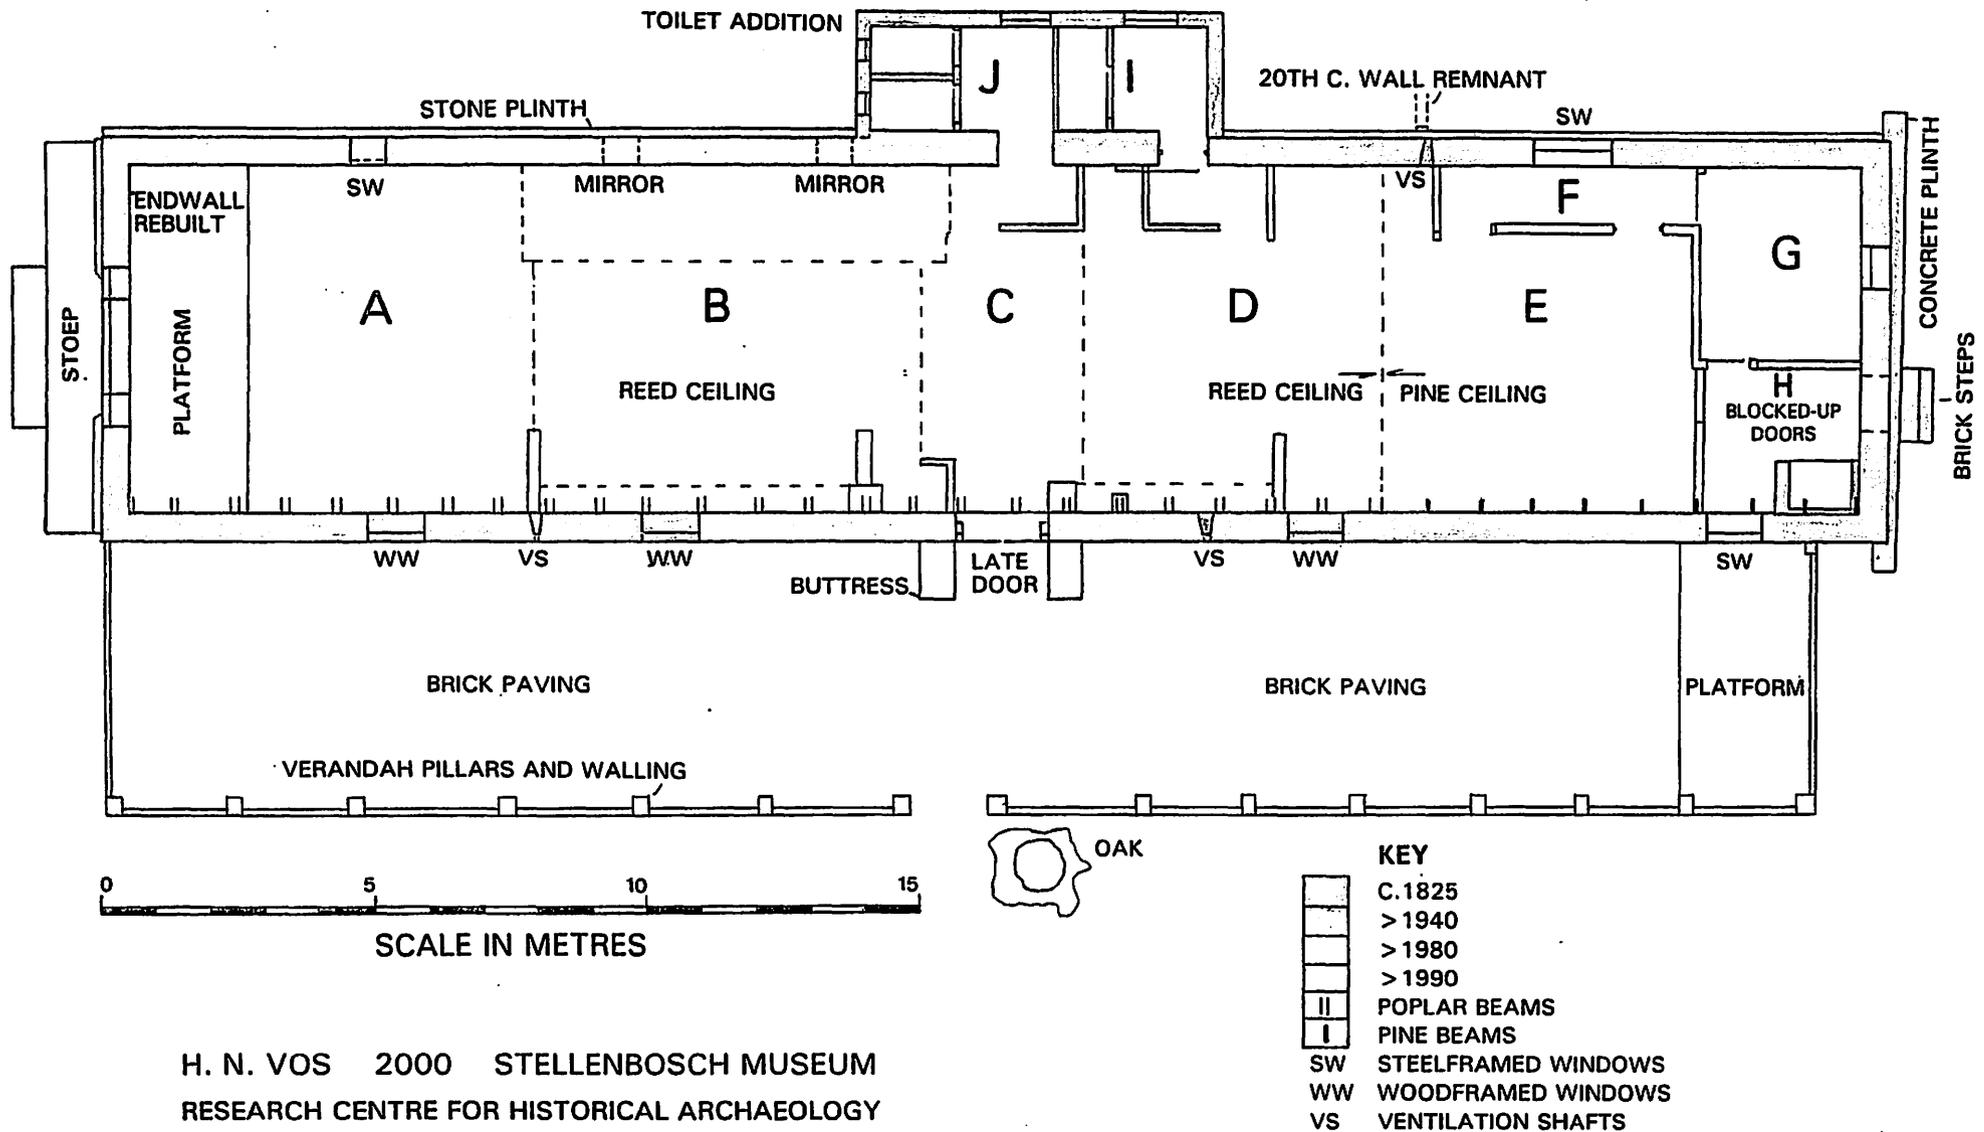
Ground plan of De Balke which details the time periods and various additions or alterations (Vos, Jan. 2000).
